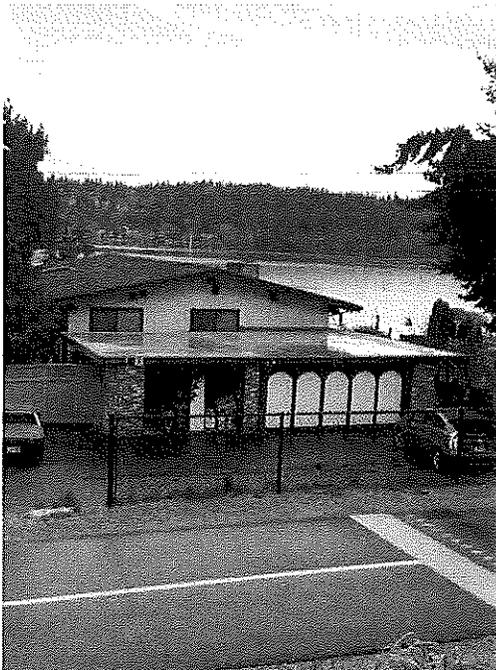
shows the house located at 15502 Beach Dr NE 98155 where an existing drainage problem exists. This drainage issue is along the flow path for NE 155th Street (Flow Path #1)
